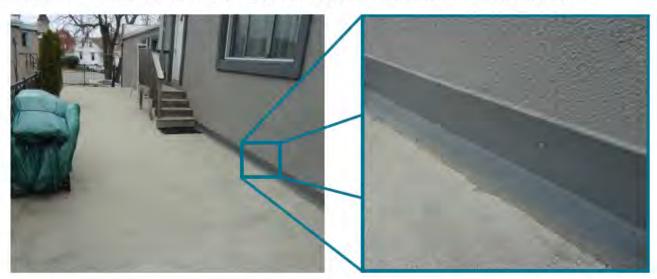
EIFS "(im)perfect barrier": Original cavity drainage was not maintained during repair; unsealed fasteners through the sheet metal are a possible leakage path.
